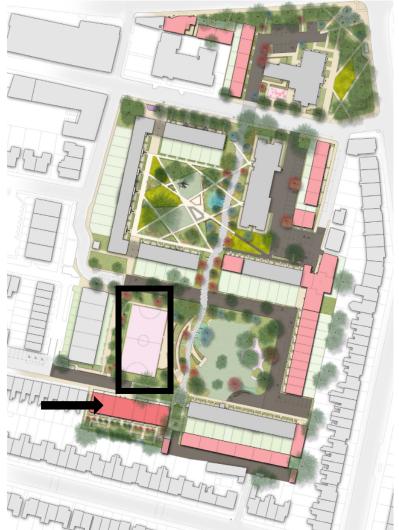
Arrow shows new Block H (23 x 1 bed units for over 55s) where Mitchison Road ballcourt was initially located prior to being relocated south (new location shown in rectangle)
